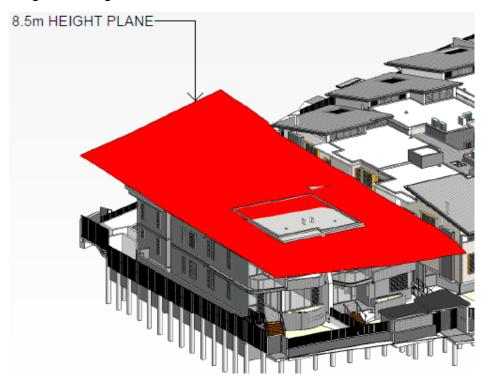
Building height blanket (8.5 metres) depicting building height breaching elements
